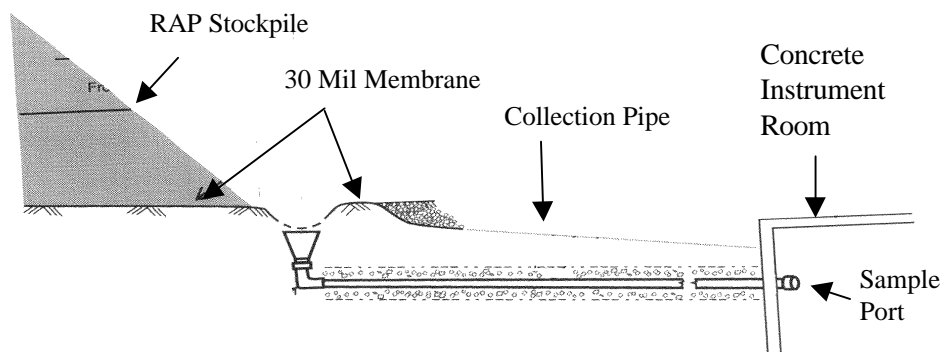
Site Layout of Experimental RAP Pile (Sadecki et al., 1996)
